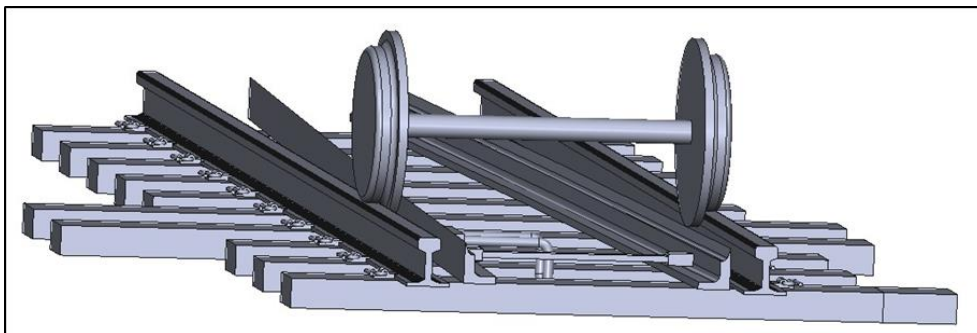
3D drawing of turnout (out tolerance)
